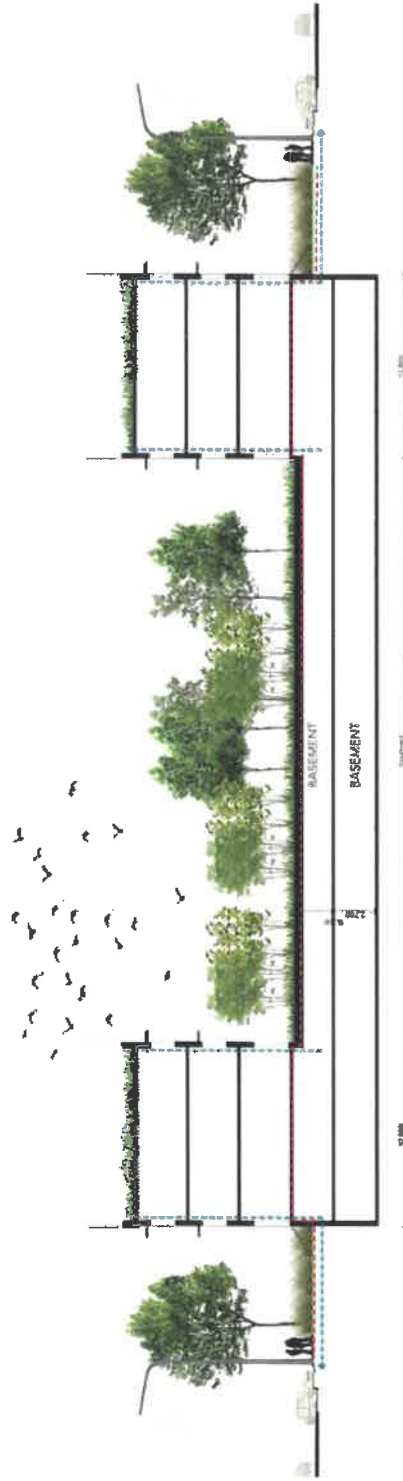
Diagram showing basement parking lot disengaged (max 1.5 m on street frontage) from the natural ground level, to create a raised ground floor of the building.
